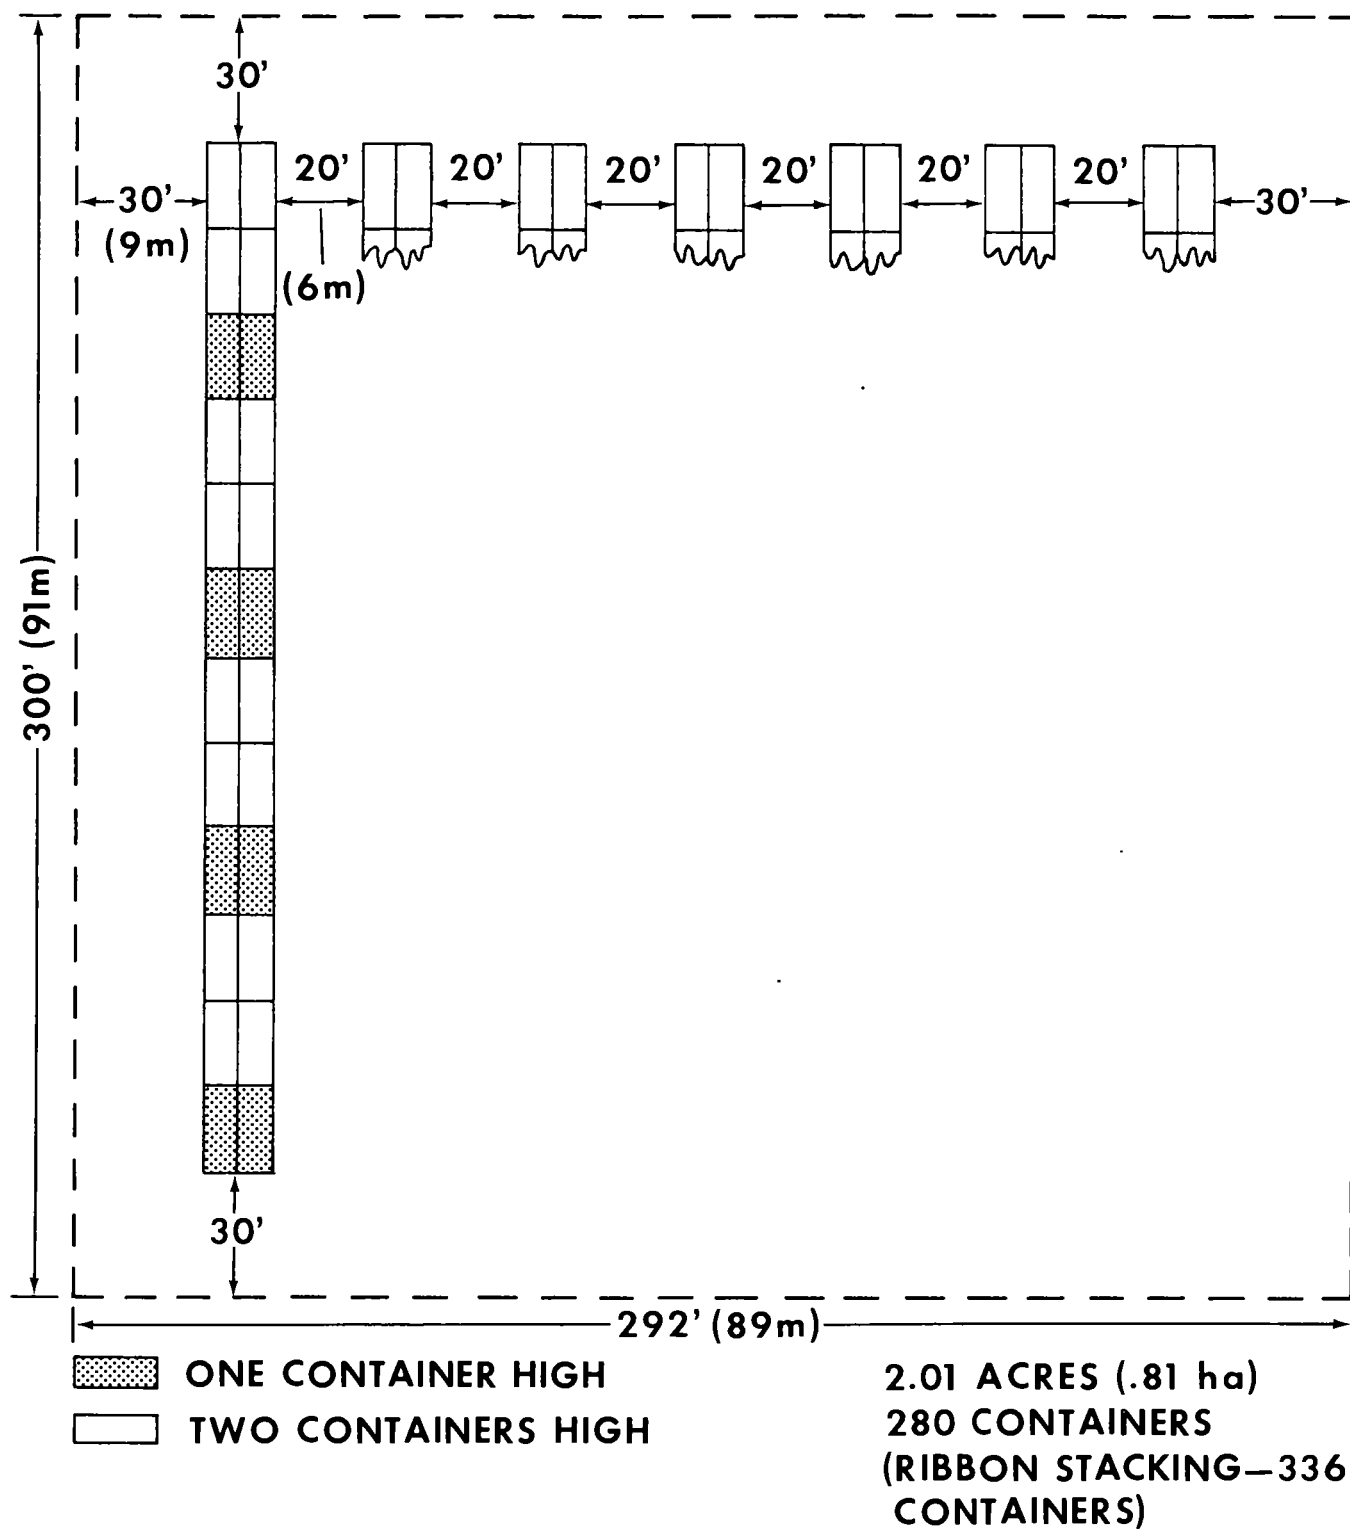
Cluster plan for sideloader turret stacking of 20-foot containers—20-foot working aisle and 60-foot intersecting aisle.
